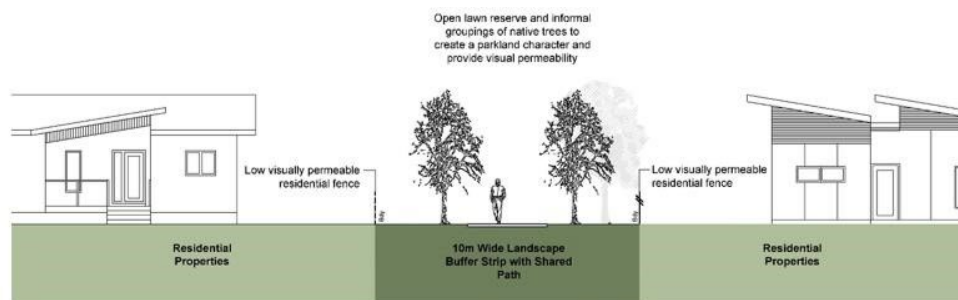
D: Cross section illustrating the 10m wide Landscape Buffer Strip with Shared Path
